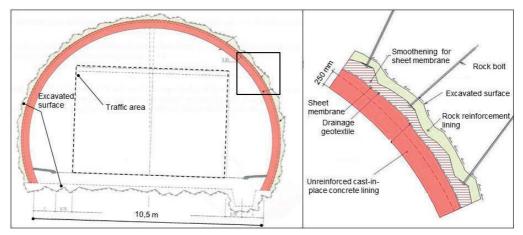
Suggested design with cast-in-place tunnel lining for modern two-lane highway tunnels in hard rock in Norway. Left: full cross section. Right: detail of lining structure (NPRA, 2012)
